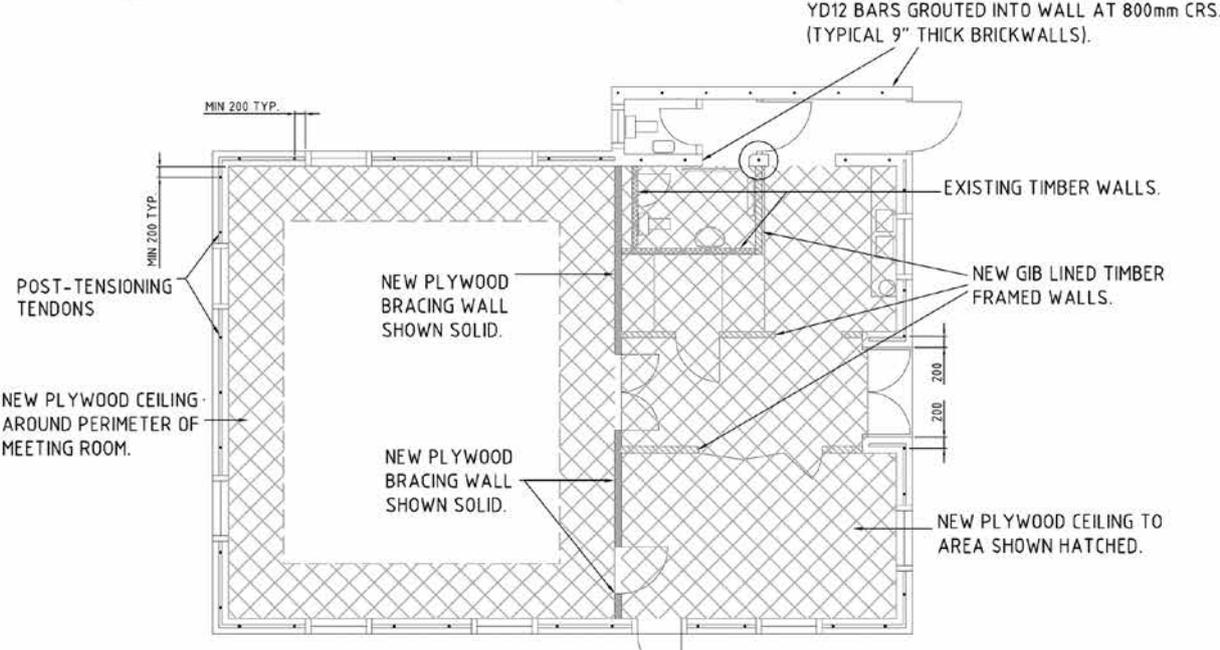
2014 Approved Plan - Meeting Room ceiling edge.
